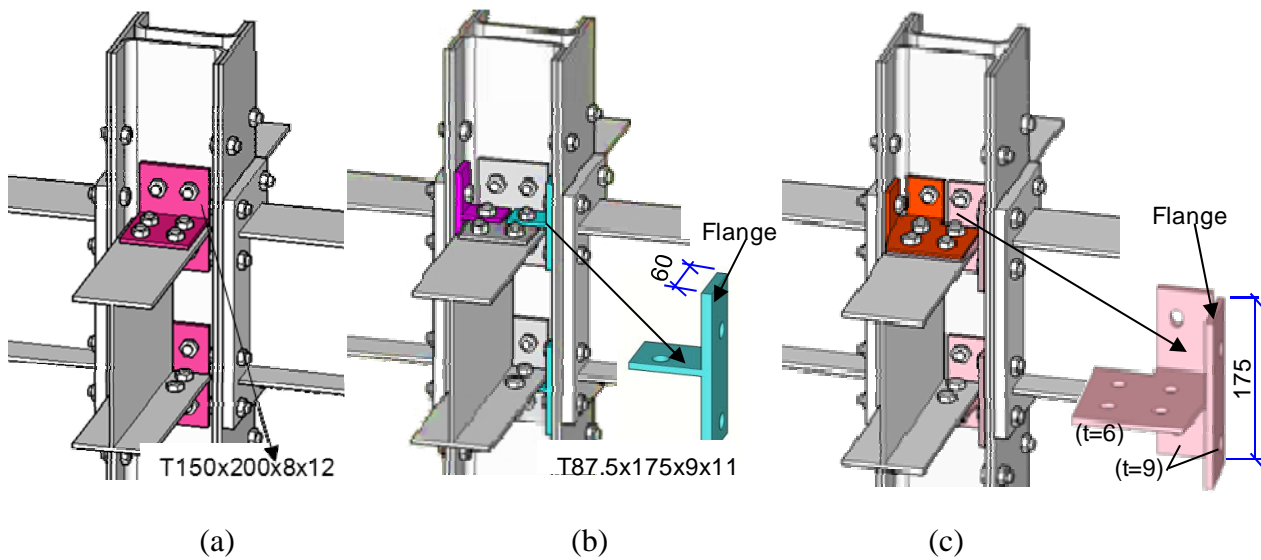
Patterns of the beam-to-column connections: (a) no stiffener; (b) Tee stiffener; (c) angle stiffener (unit: mm).
